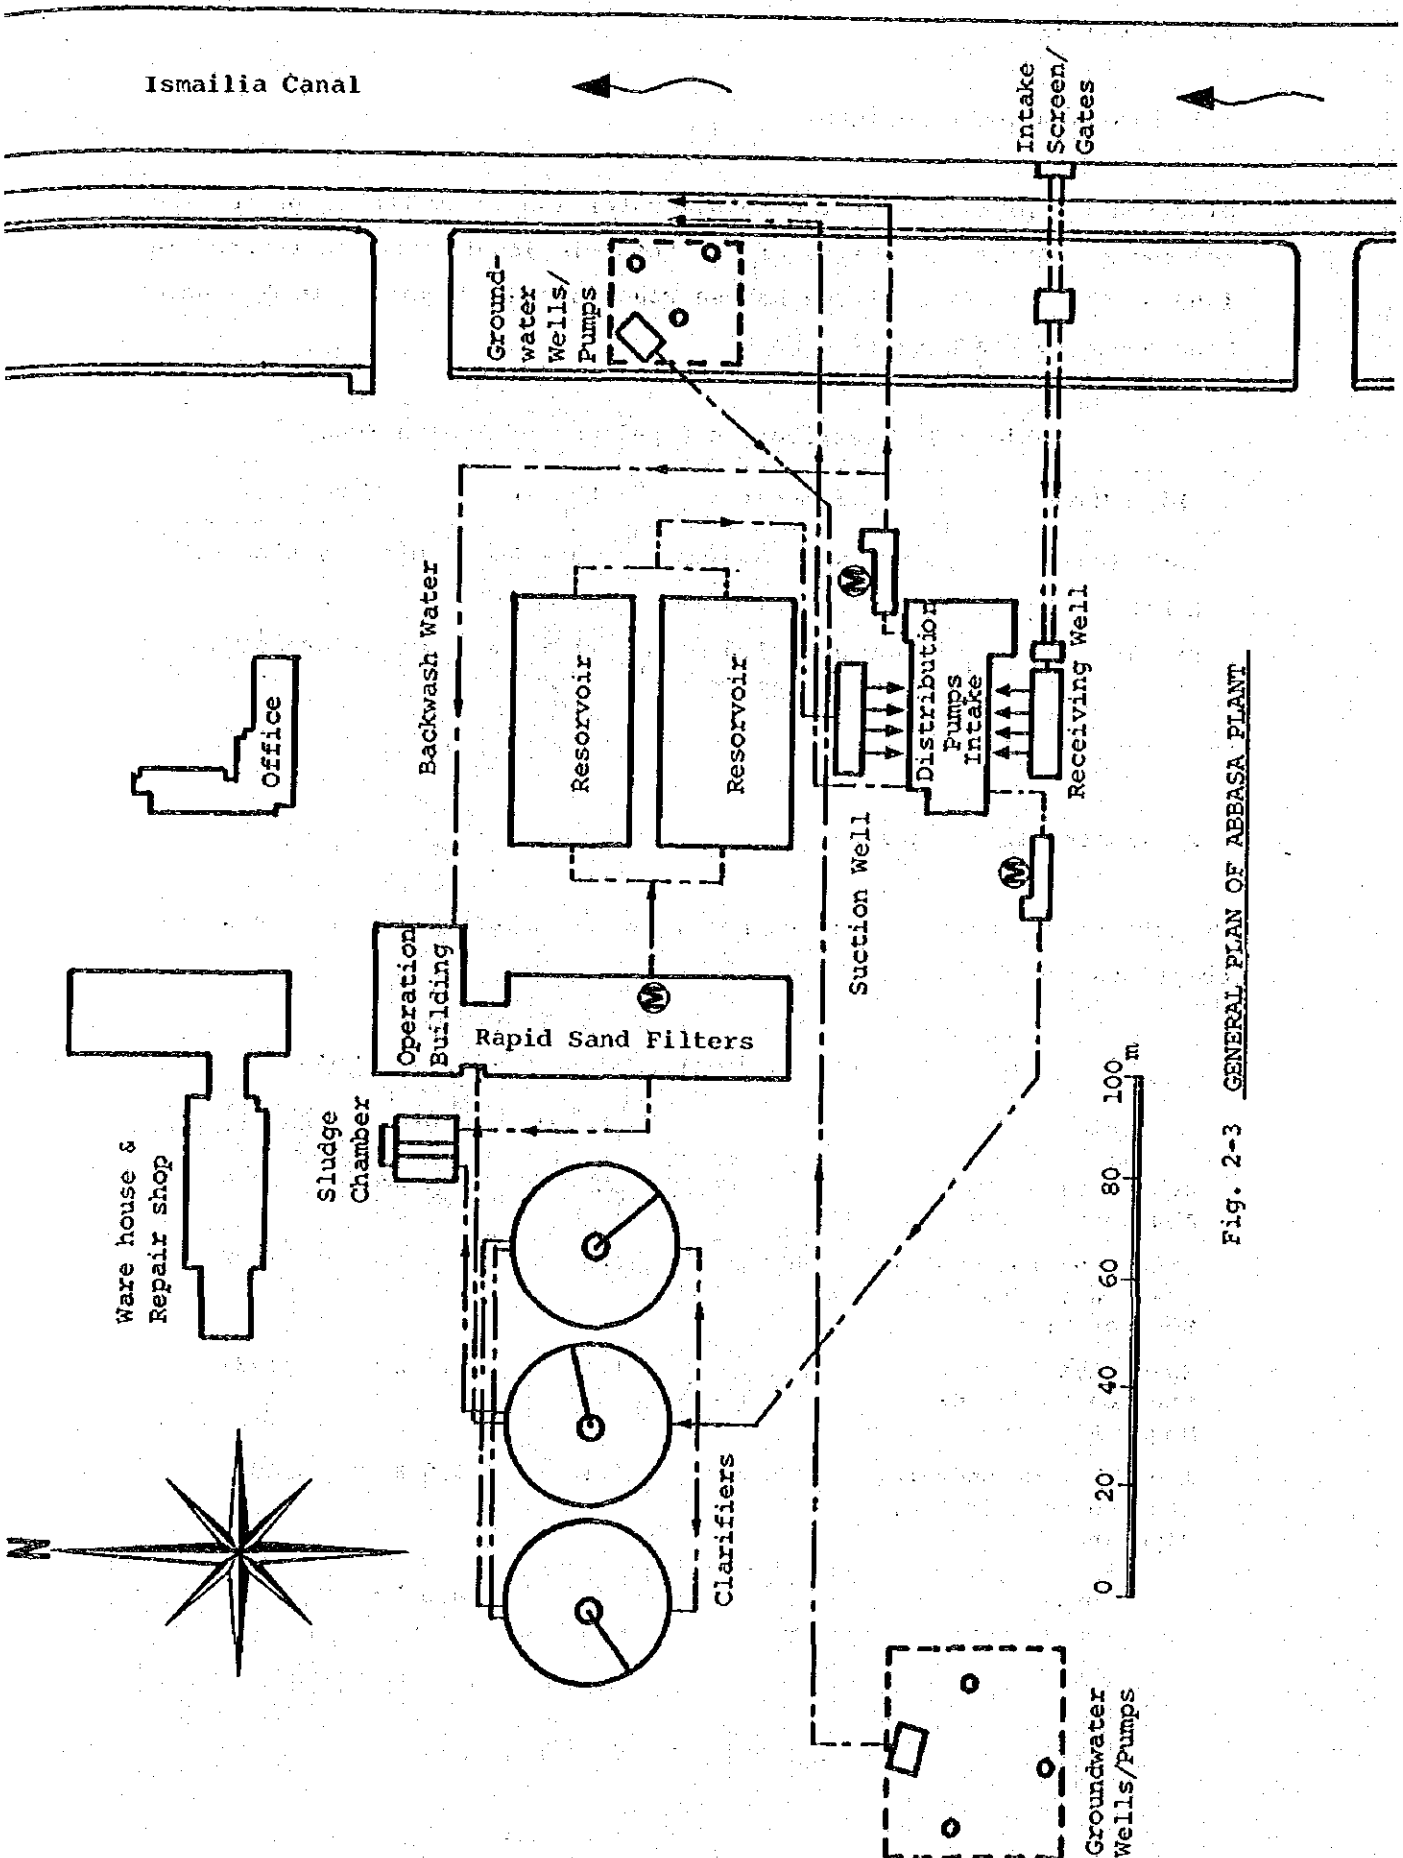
GENERAL PLAN OF ABBASA PLANT
